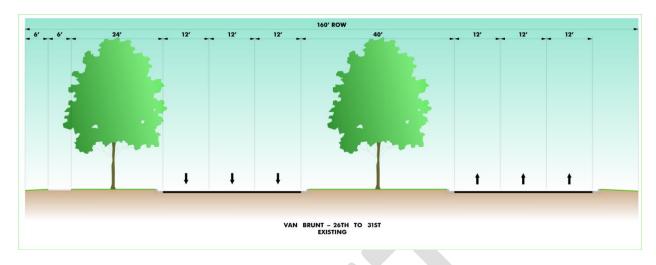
Enhanced Streetcar Truman Road Alignment Typical Section- 26th-31st Street Existing Conditions
